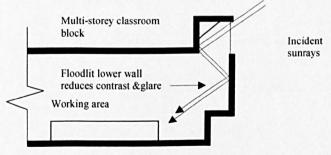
Stepped ceiling solution which incorporates wall wash with clerestory system
